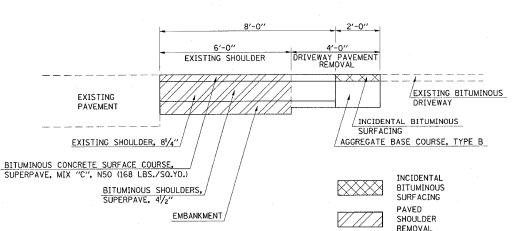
DETAIL OF PRIVATE ENTRANCE AT RT. STATION 33 + 86.62
